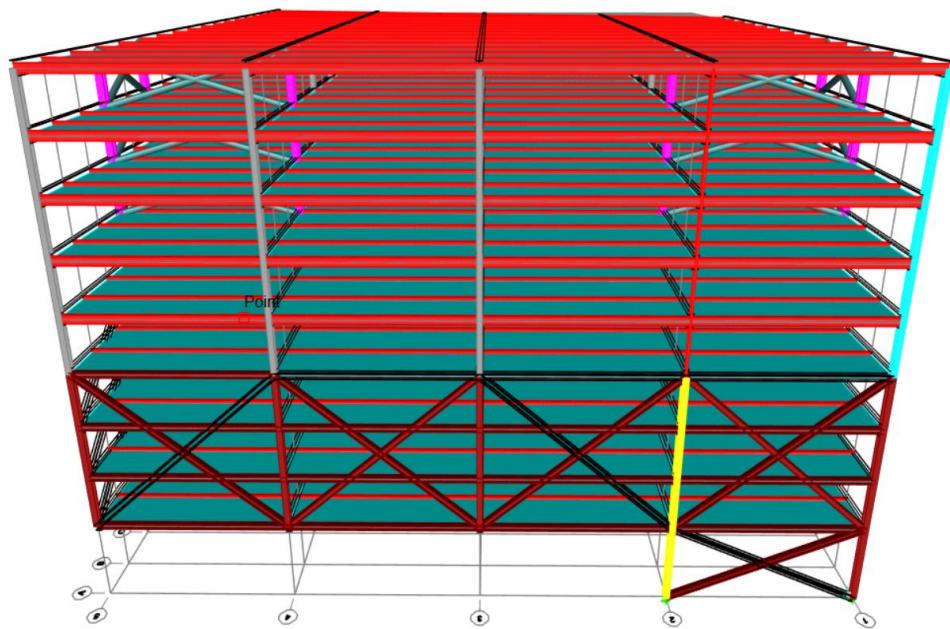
Elevation Structural Model for Proposal 1 (SAP2000)
